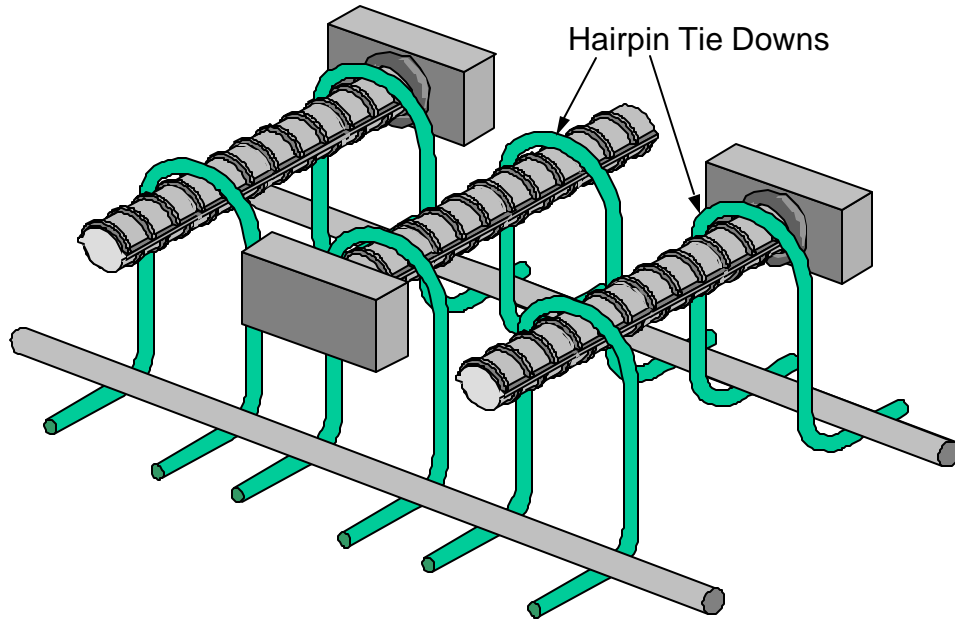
Reinforcement details of unconfined lap splice specimens
